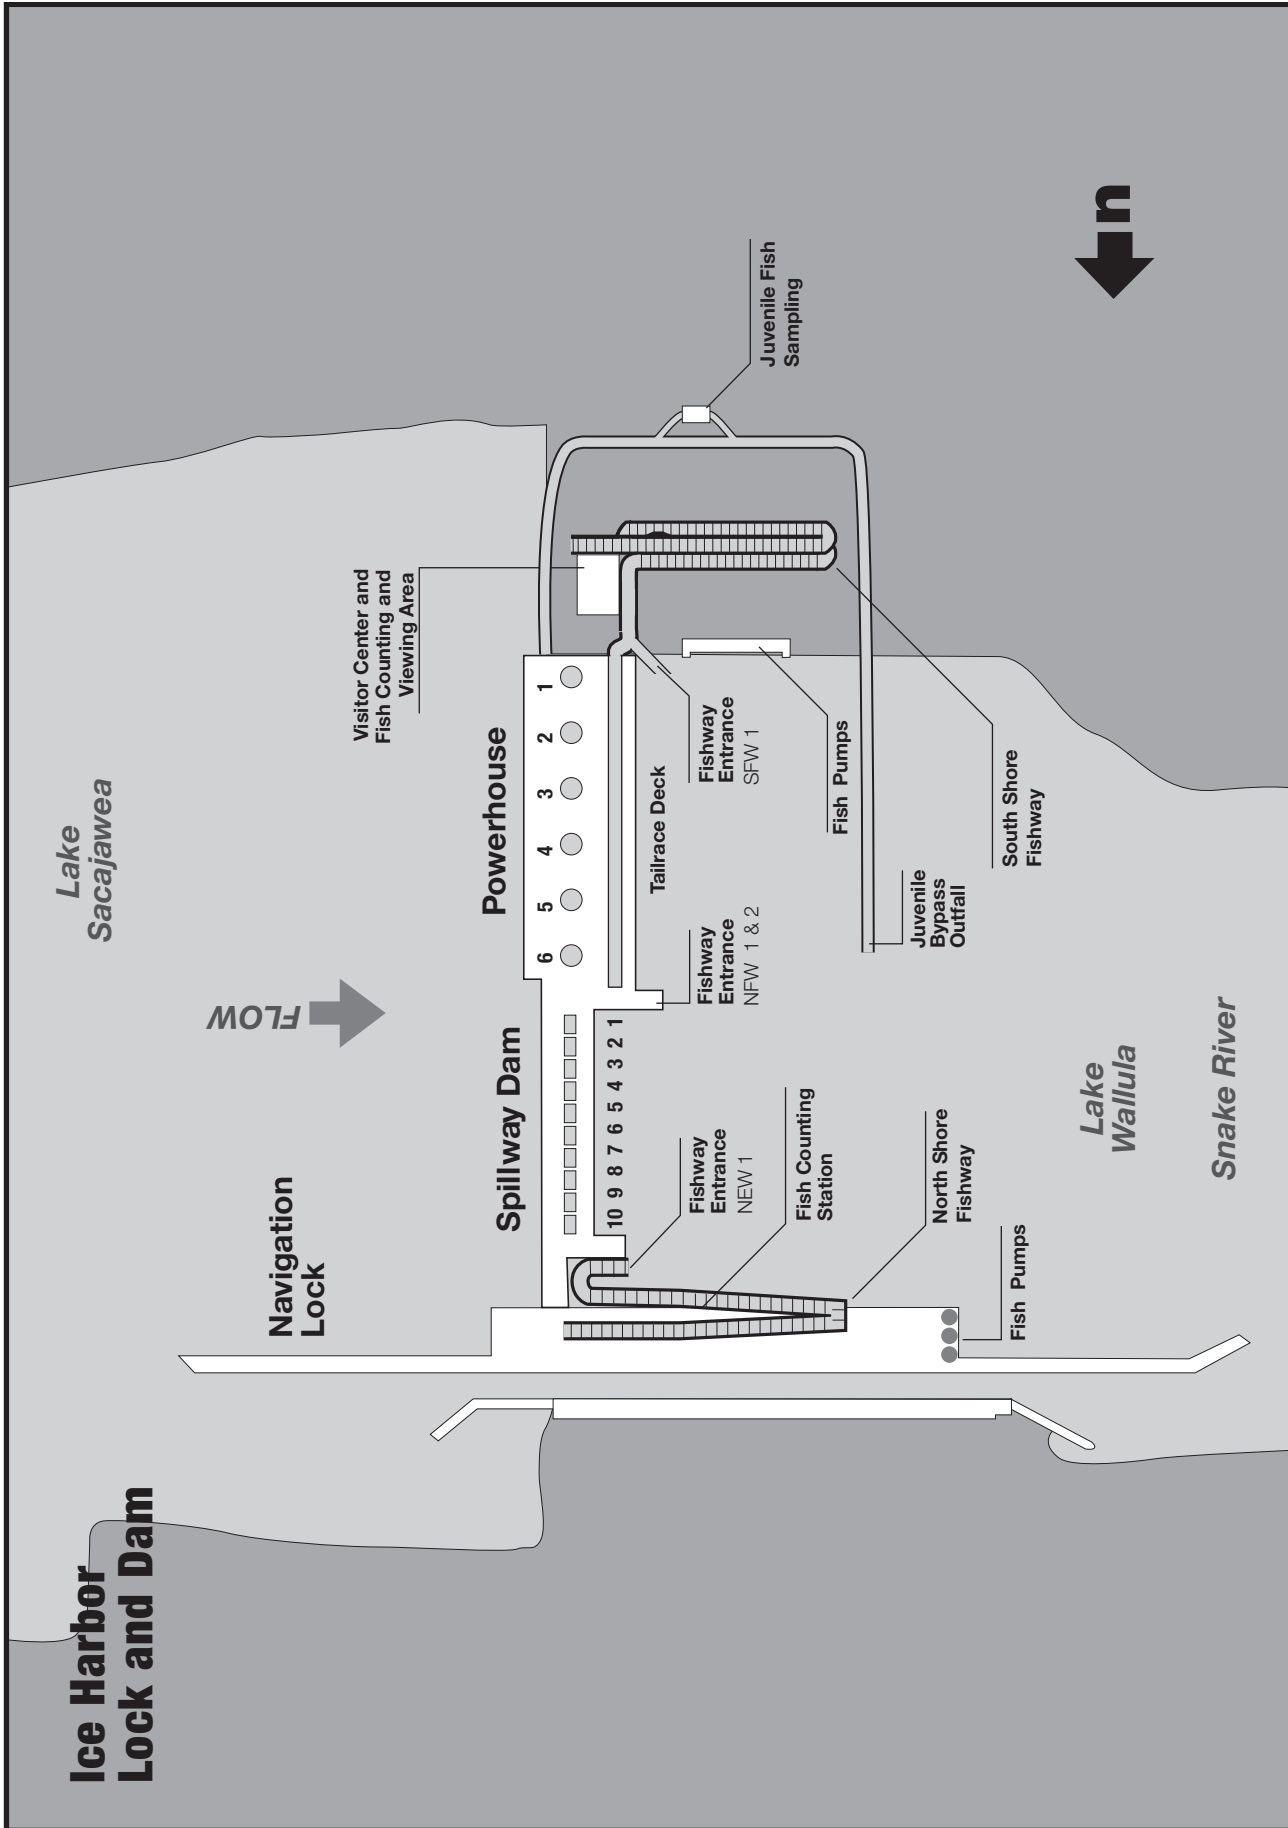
Ice Harbor Lock and Dam general site plan.
